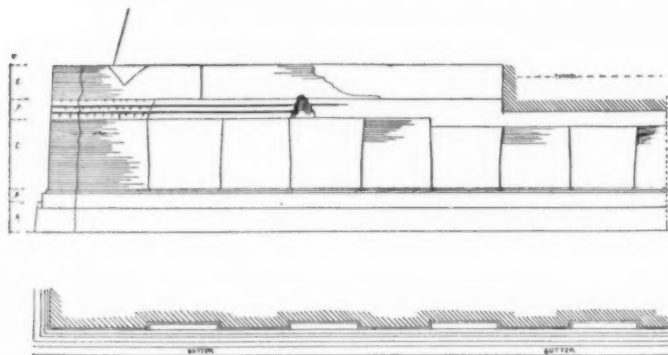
ELEVATION AND PLAN OF THE N. W. FAÇADE OF THE ZIGGURAT, AT N. E. END. (Scale, .042 in. = 1 ft.)
